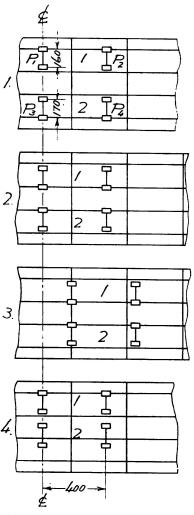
State of loading on the floor system of the Otanigawa Bridge
